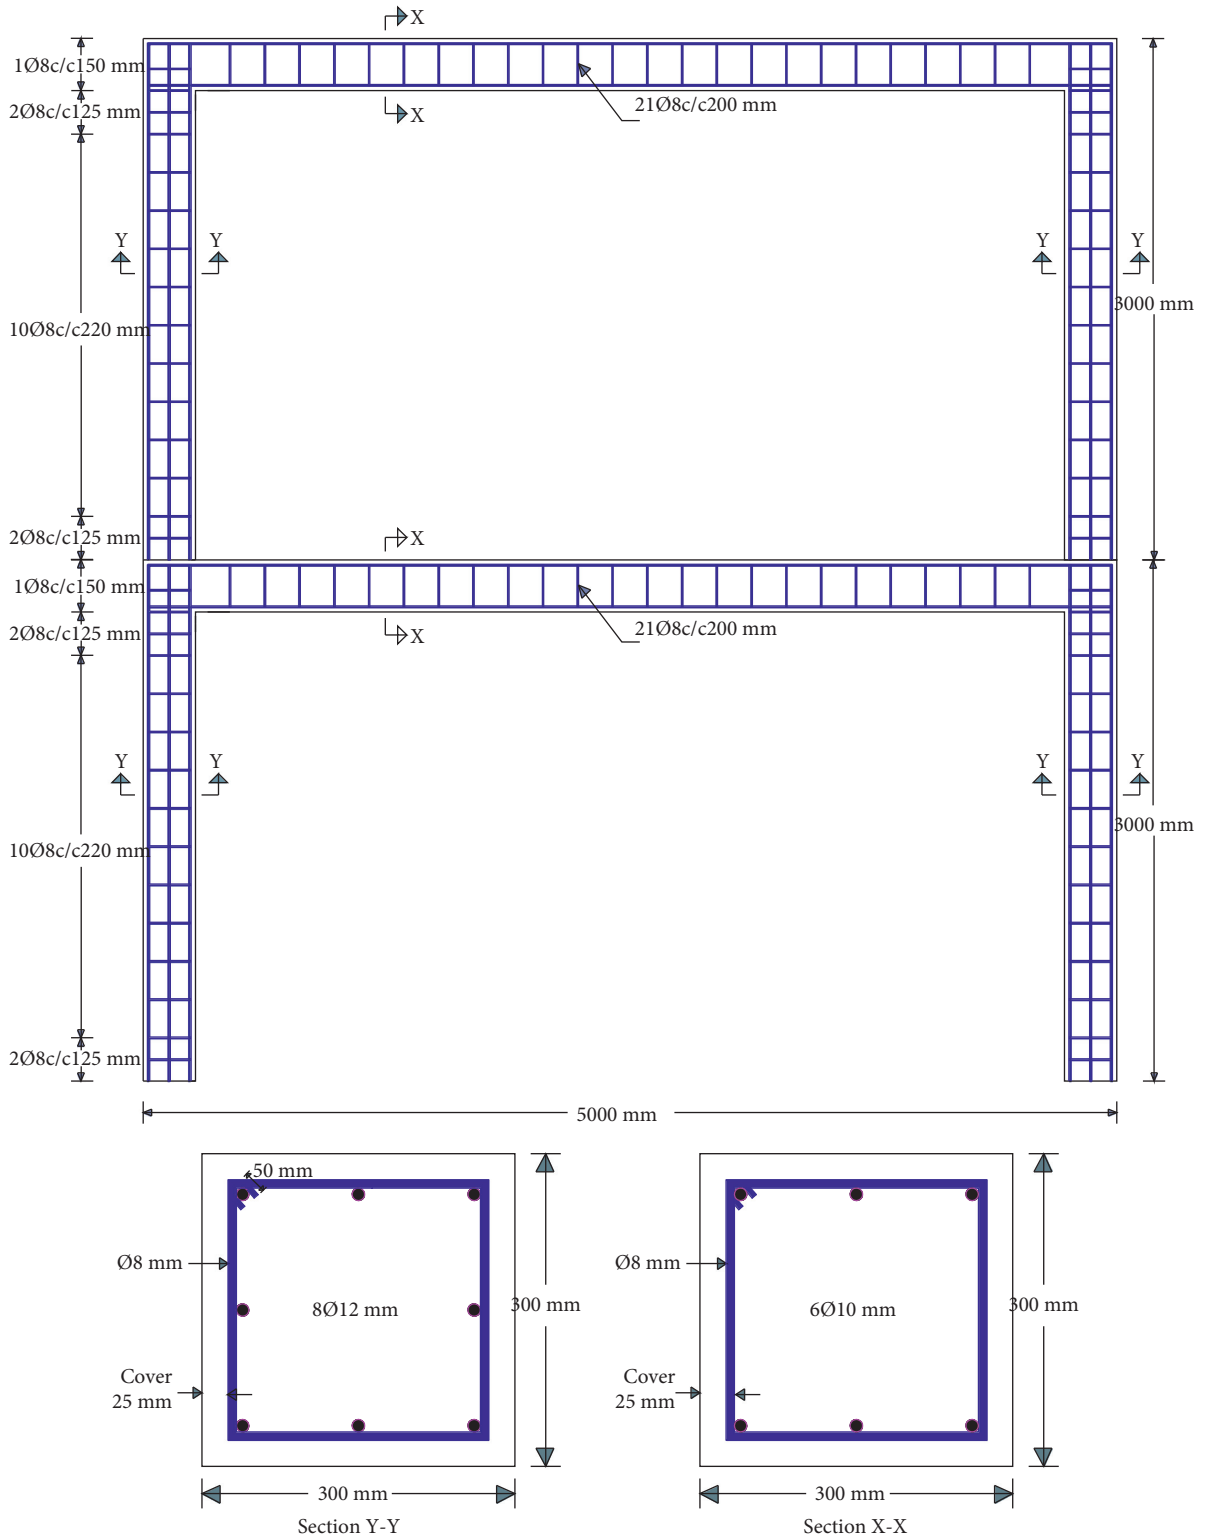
Reinforcement detailing for FRM_REI_DET_#1.
